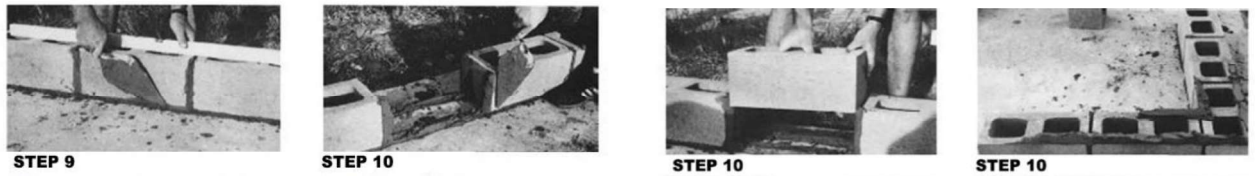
Concrete Masonry Units Steps. Source: CMA (2007)
